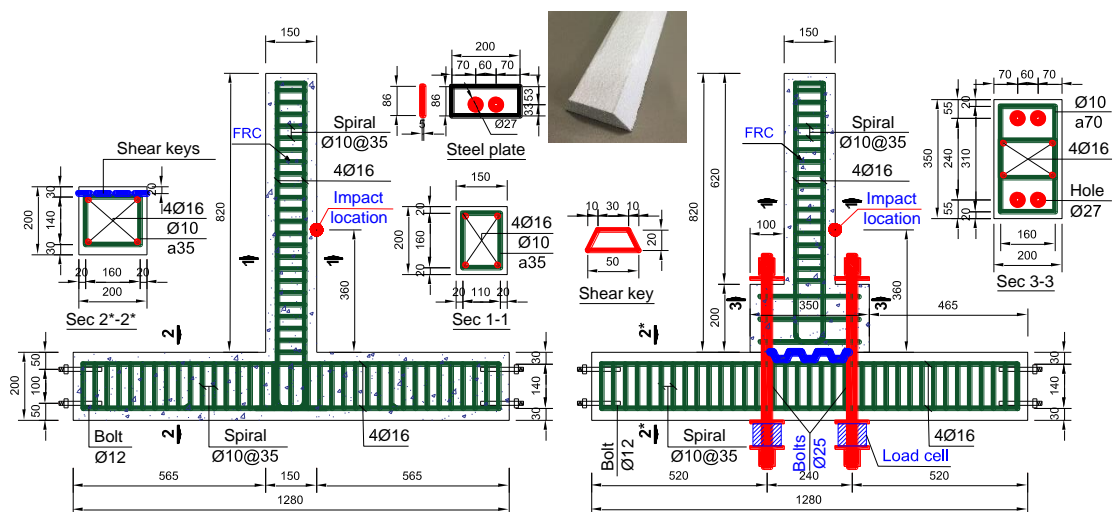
Details of monolithic specimen (Left) and precast specimen (Right) (unit: mm).
